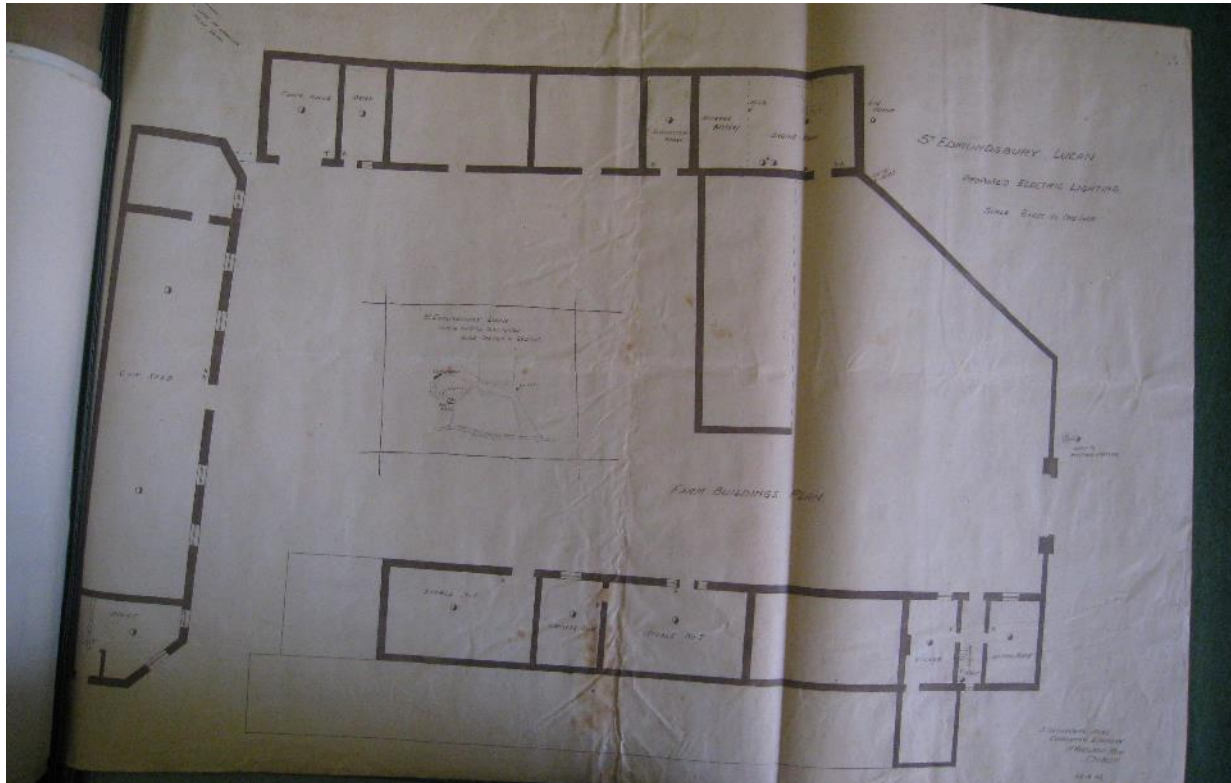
1906 Proposed electric lighting, farm buildings plan. The plan shows the barn at the east, the coach house which has only the east section remaining nowadays and a stable building at the south which is no longer in existence. Source: 1906 Proposed electric lighting S. Geoghegan
